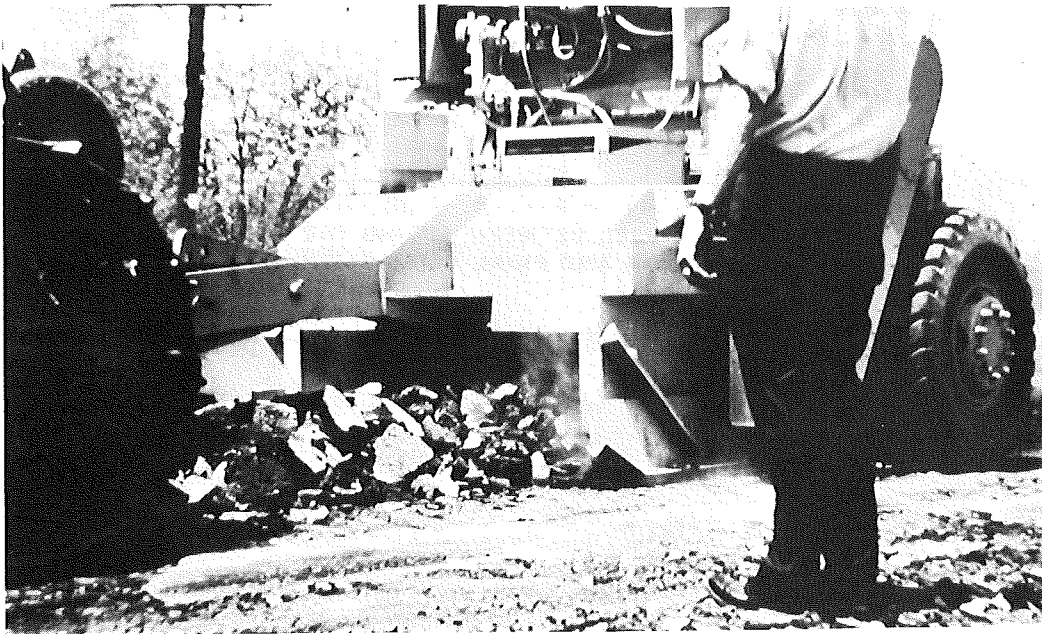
Traveling hammermill used to pulverize old bituminous surfacing.
